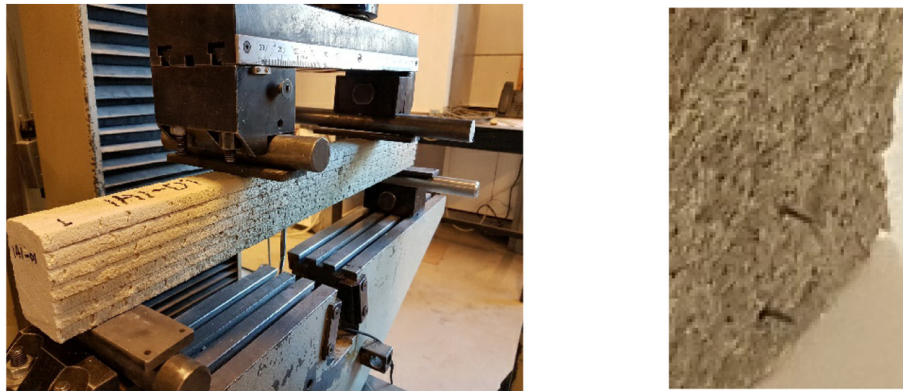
Seven-layer printed beam tested in 4-point bending (a, left), and fractured section after testing (b, right). In this specimen, final failure occurred by cable breakage.
